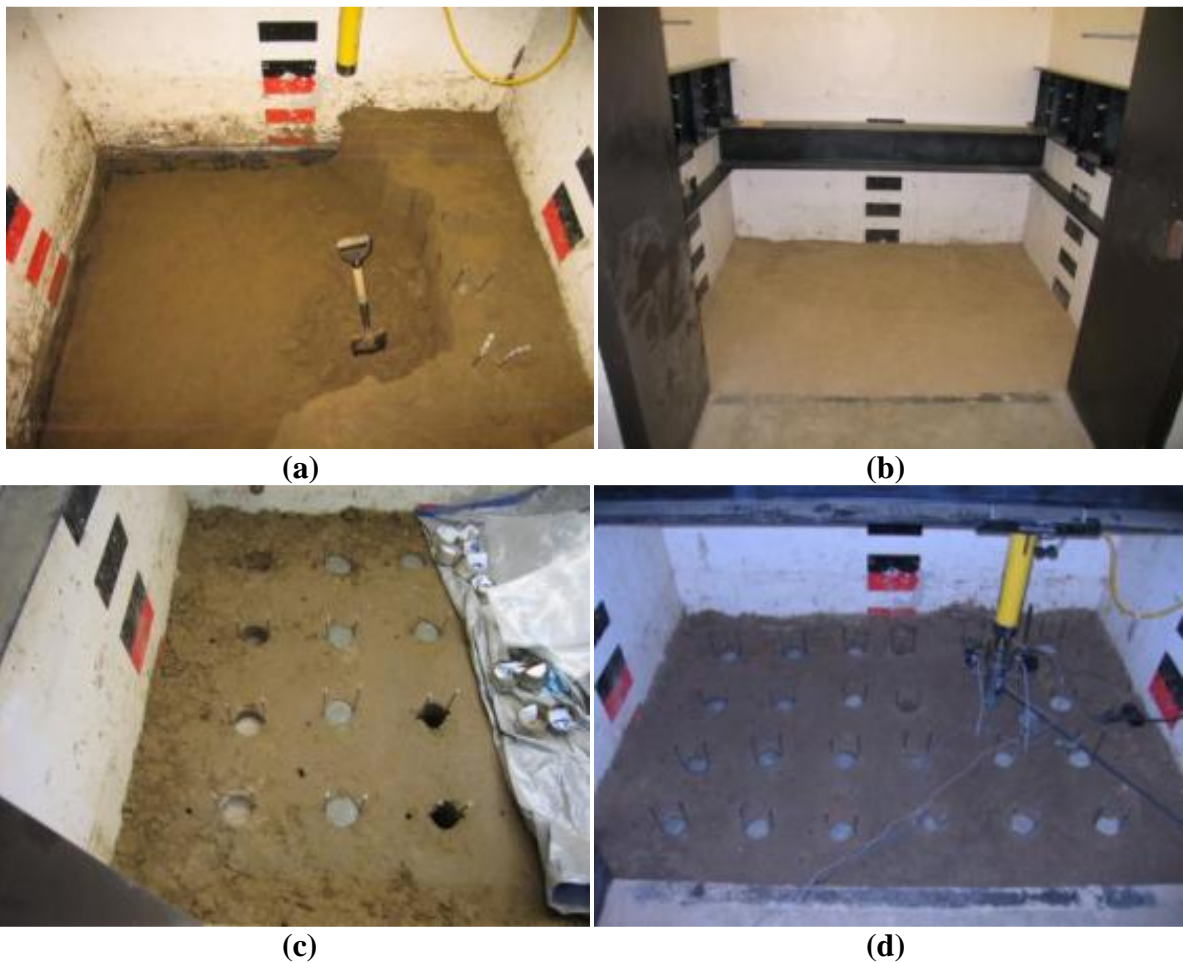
Test bed preparation (a) excavation, (b) finished after compaction, (c) placement of single piers and (d) testing of single piers
